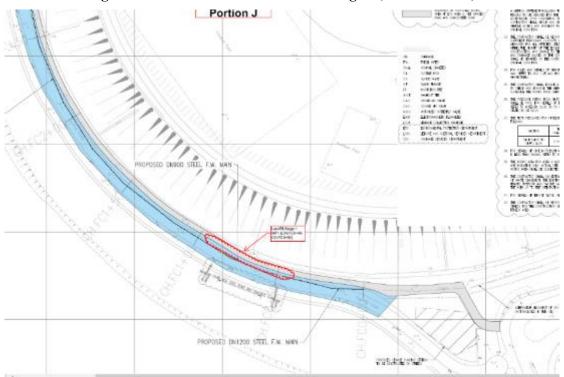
Location Plan – Landfill Stage 1 (Area FC0+42 -FC0+92)
